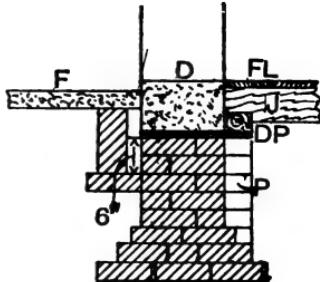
Damp-proof Course when Floor is Level with Ground.
